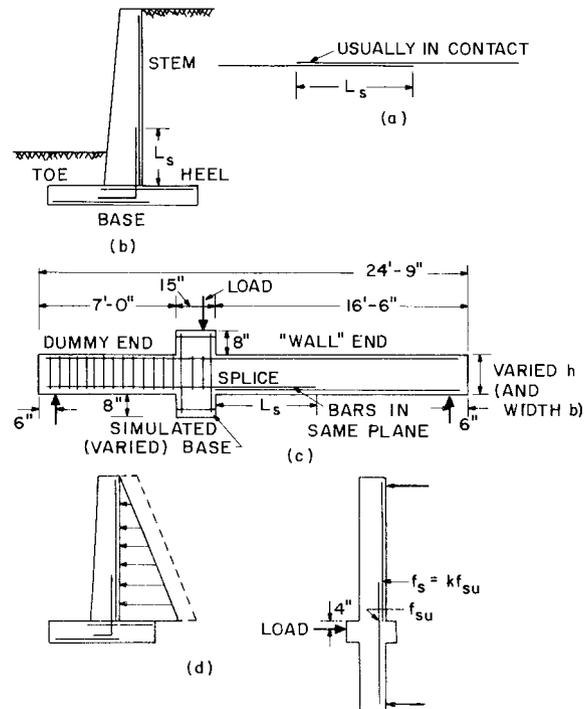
Test concept. (b) Cantilever retaining wall with typical stem bar splices. (c) Test specimen to simulate wall splice. (d) Wall loading compared to test loading.
